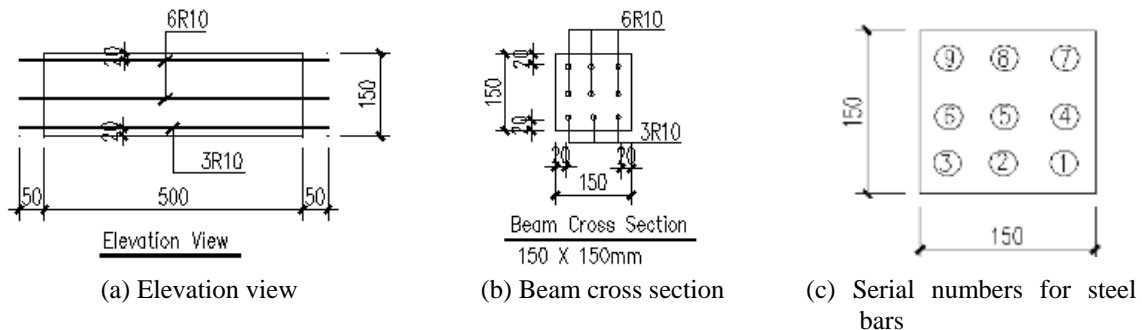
A schematic diagram illustrating concrete beams used in this study
